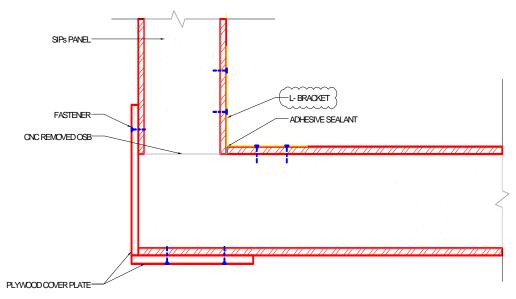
AutoCAD model of typical thermal chamber corner assembly details [14]
